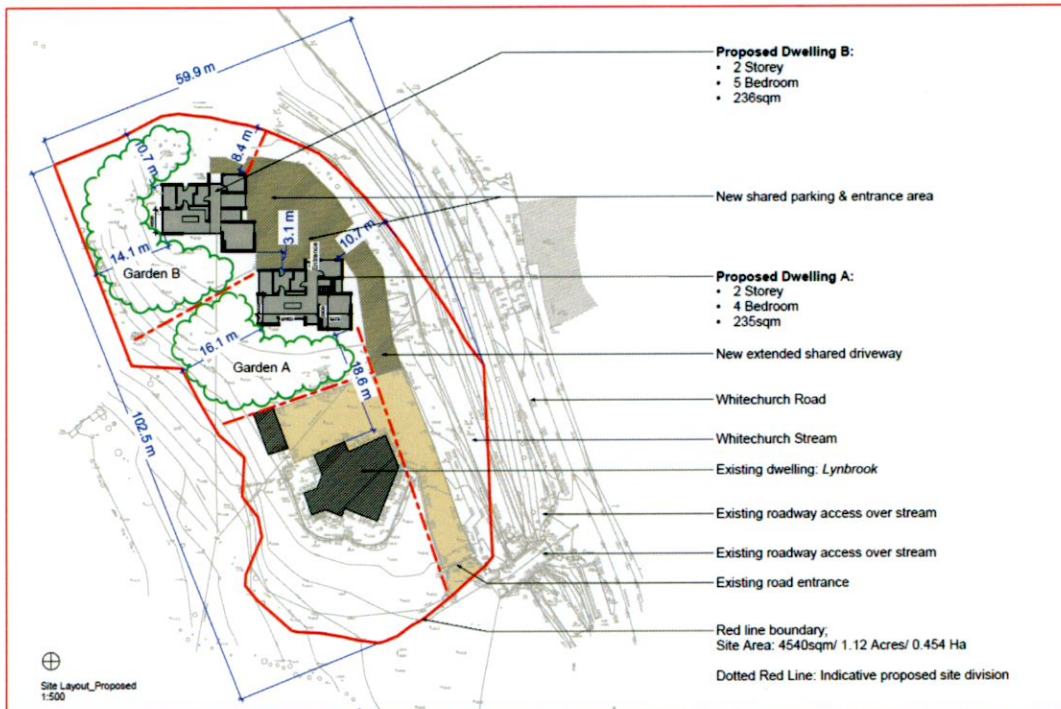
showing proposed site layout with curtilage denoted in red.
